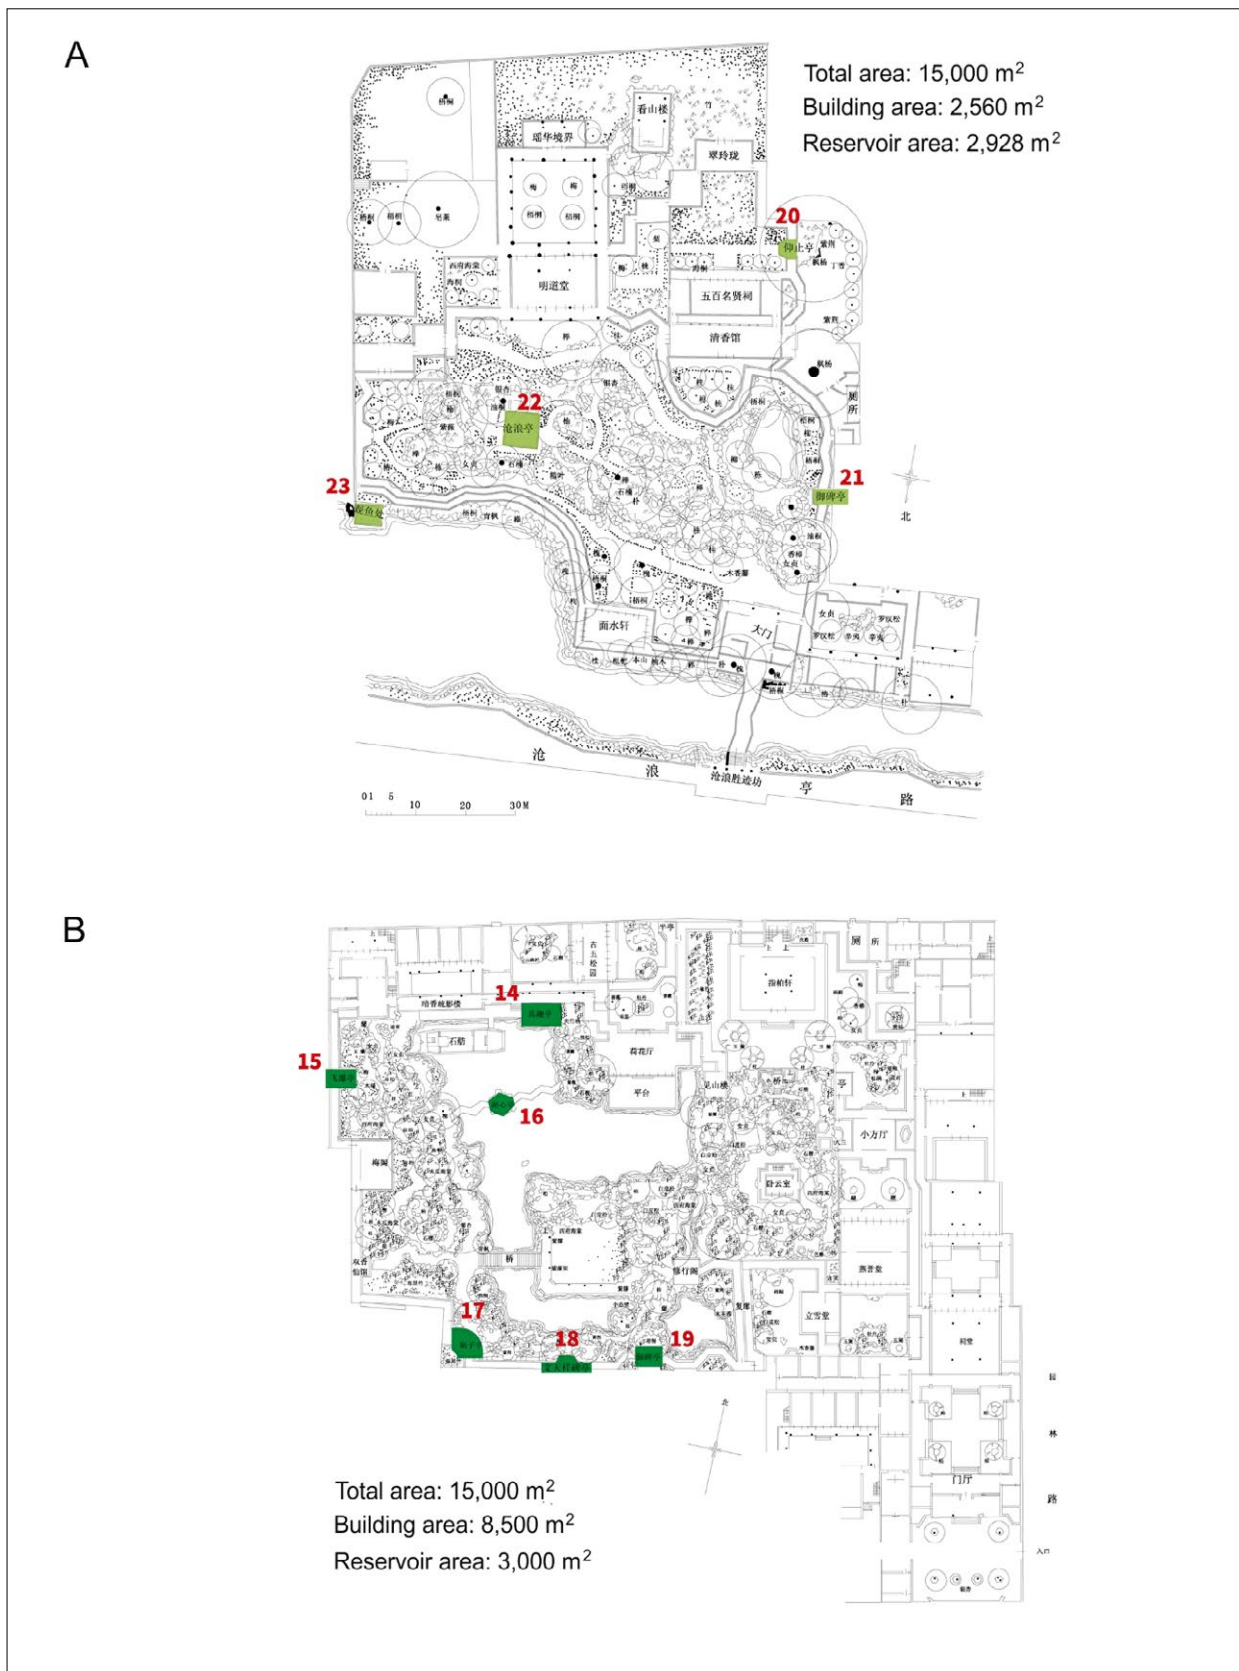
Examples of the most famous Suzhou private gardens: A—plan of the Canglang Ting Garden, B—plan of the Shi Zi Lin Garden.
